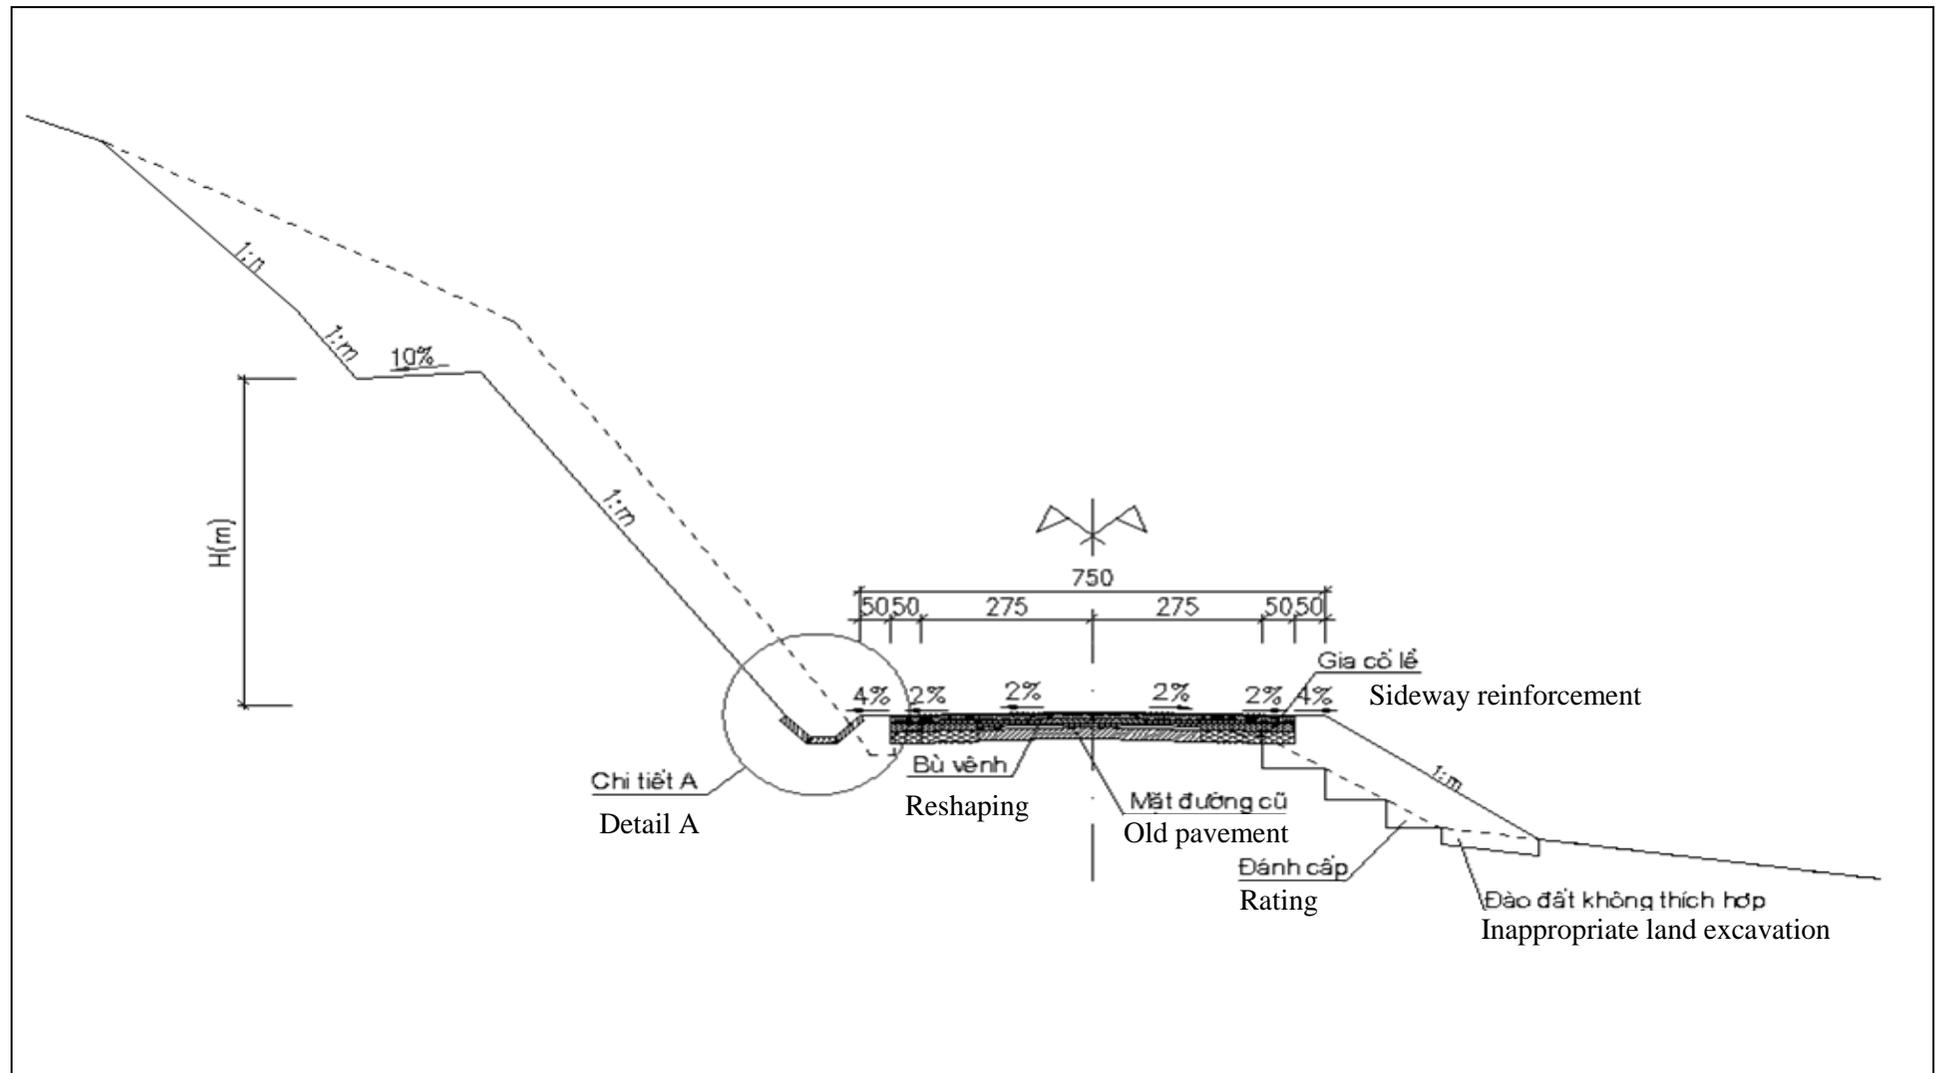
Typical cross section of road section with mountainous area scale IV ($B_n = 7.5$ m, $B_m = 5.5$ m)
